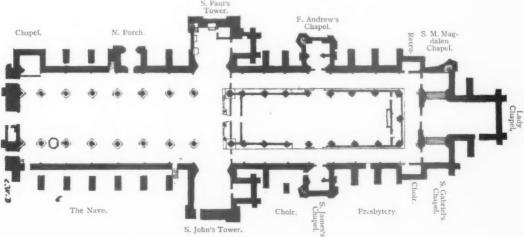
EXETER CATHEDRAL. PLAN.
